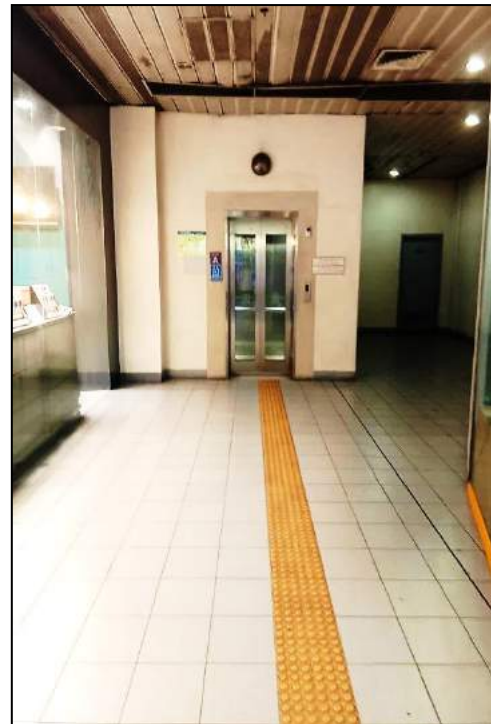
Floor marker facilitates accessibility of passengers having poor eyesight with enhanced 'feel' of the path on the floor (due to the embossed portions) leading to elevator at platform level.
